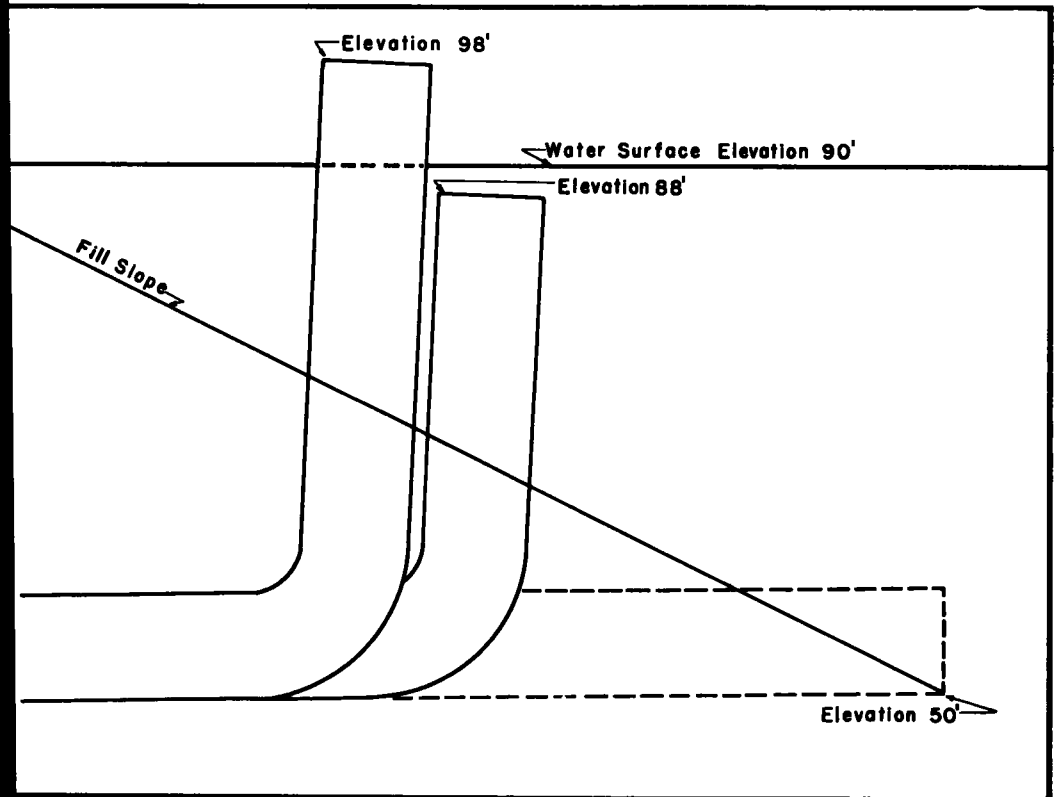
Schematic sketch of Burnt Hill culverts failure.
